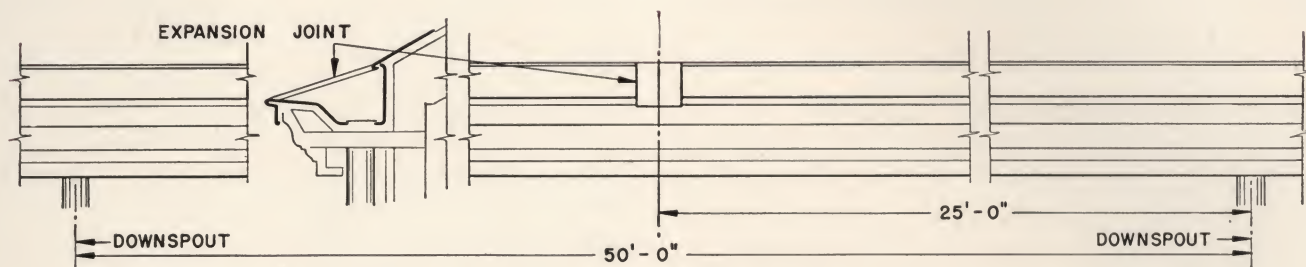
GUTTER WITH EXPANSION JOINT MIDWAY BETWEEN DOWNSPOUTS
